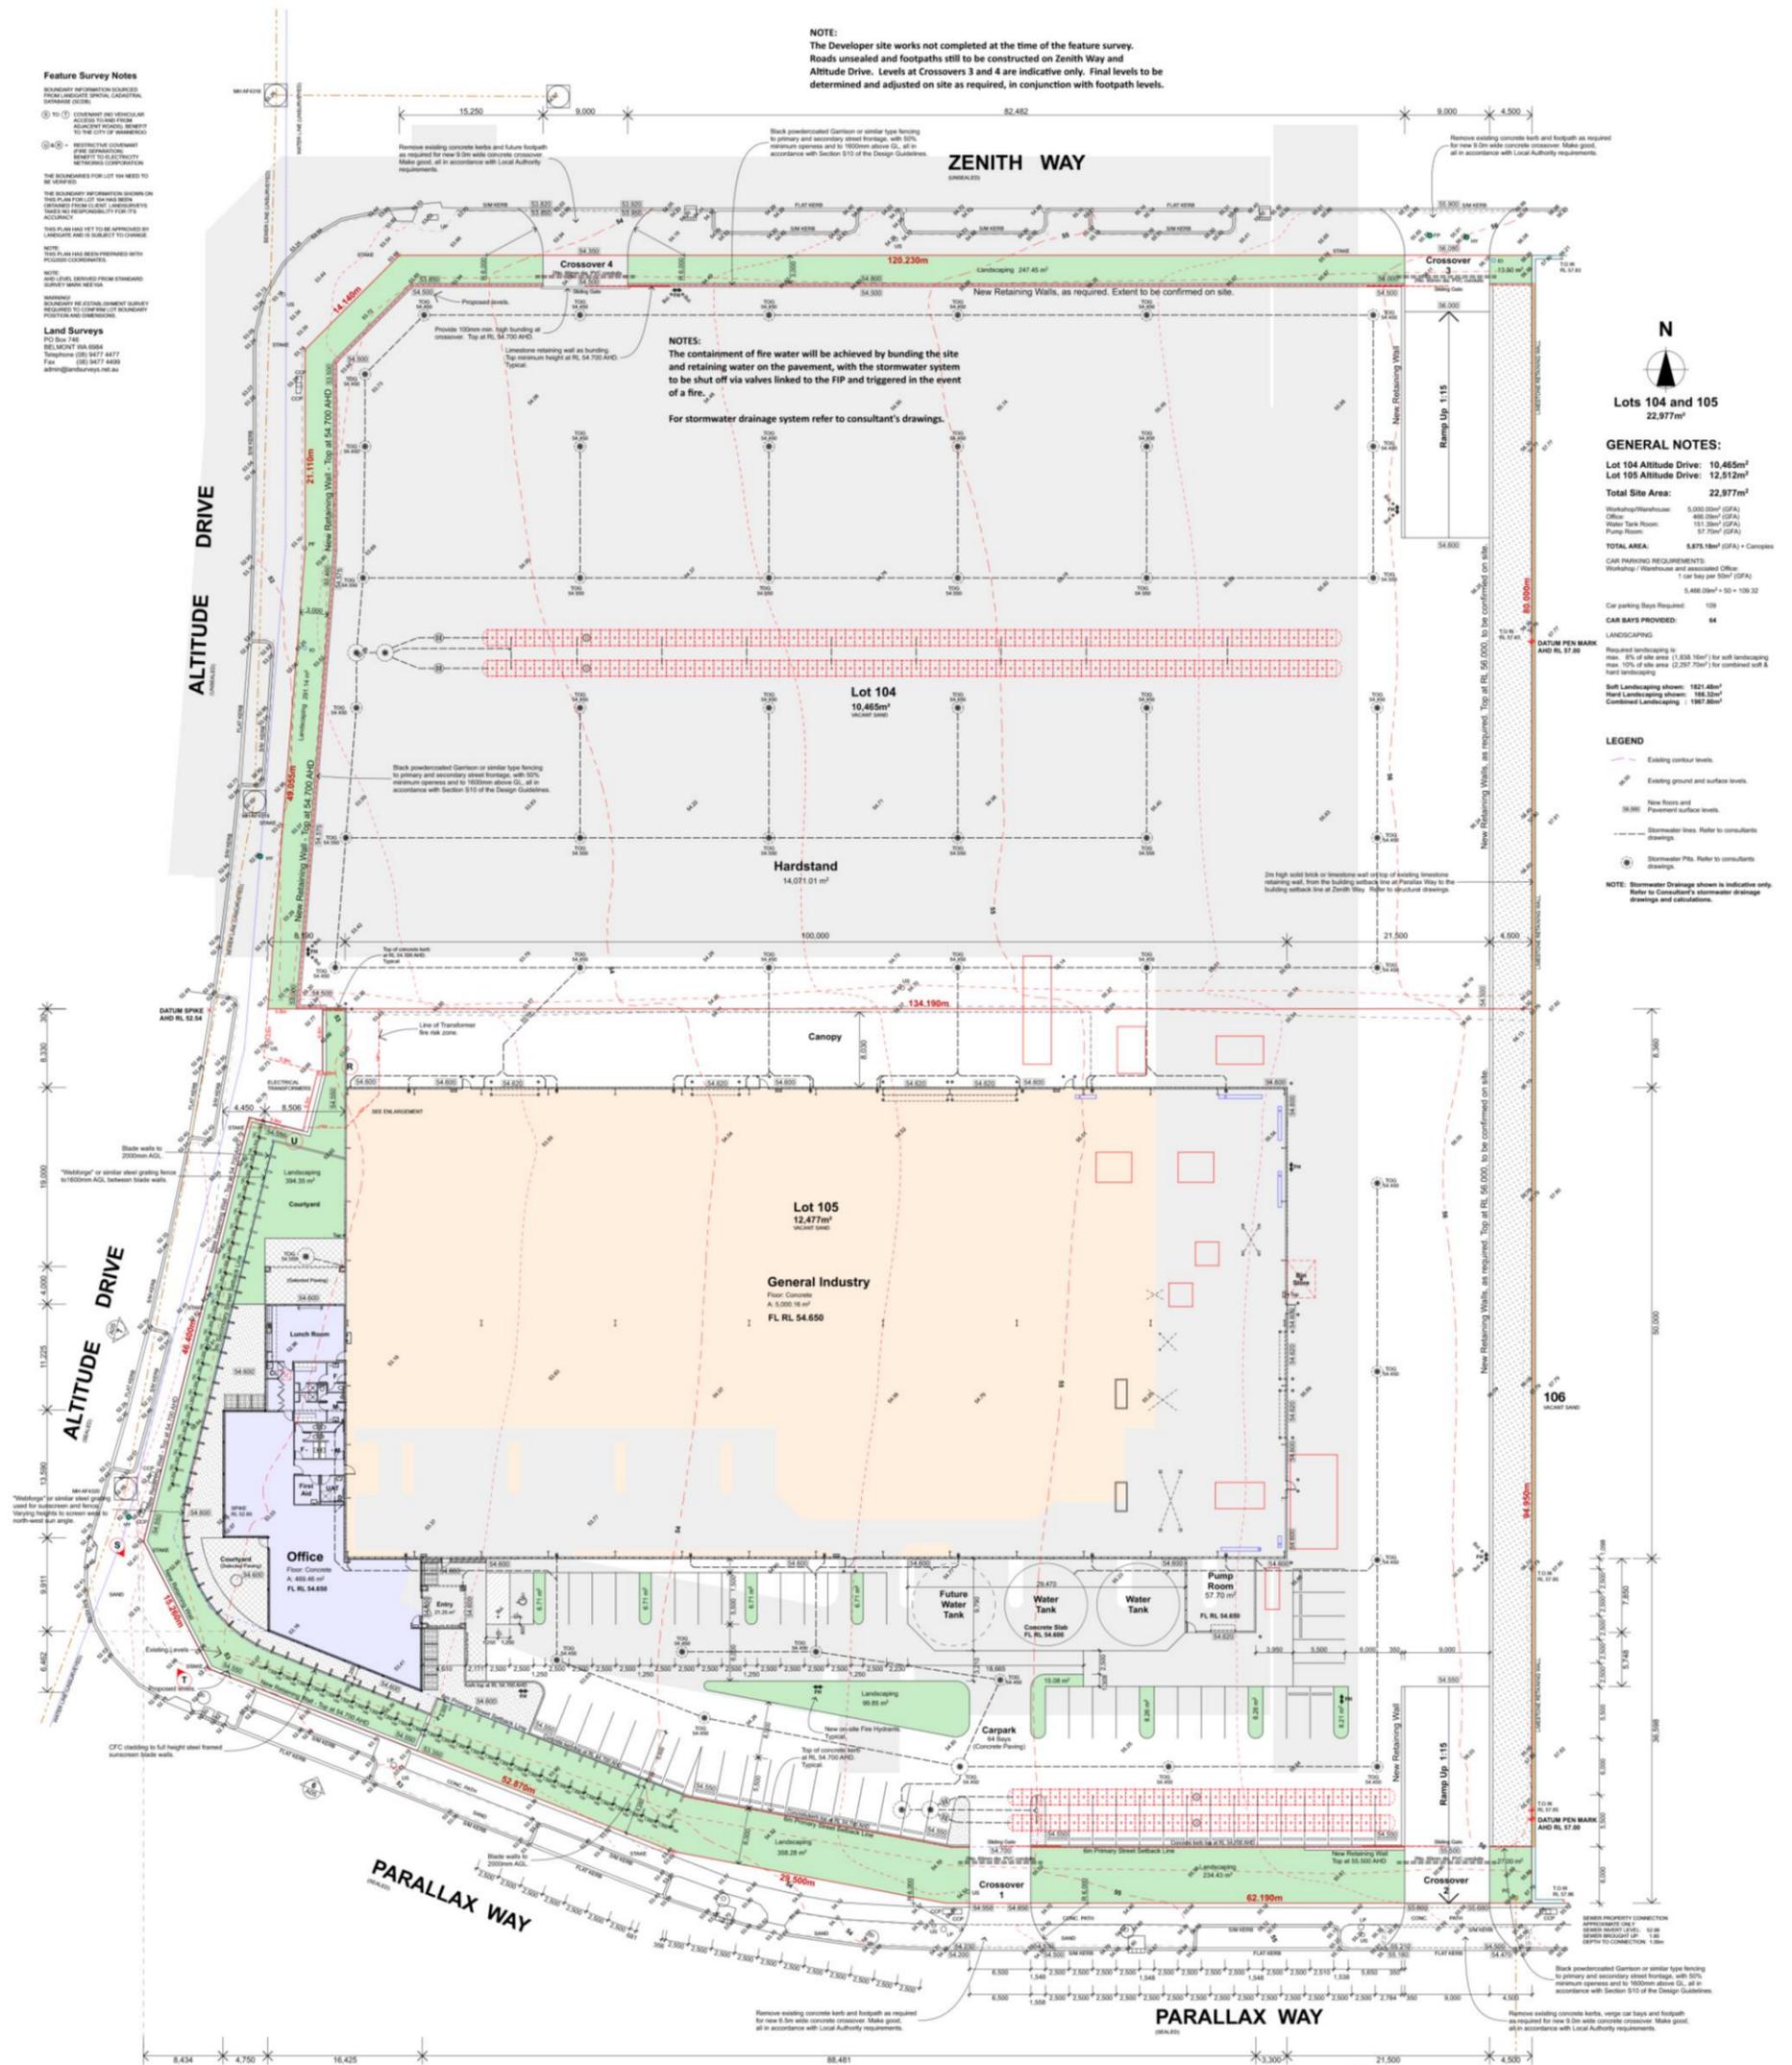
Site plan showing the proposed premises stormwater drainage infrastructure
